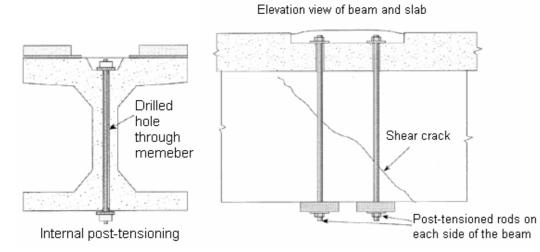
internally placed reinforcement of I-section beam and T-beam [17]
